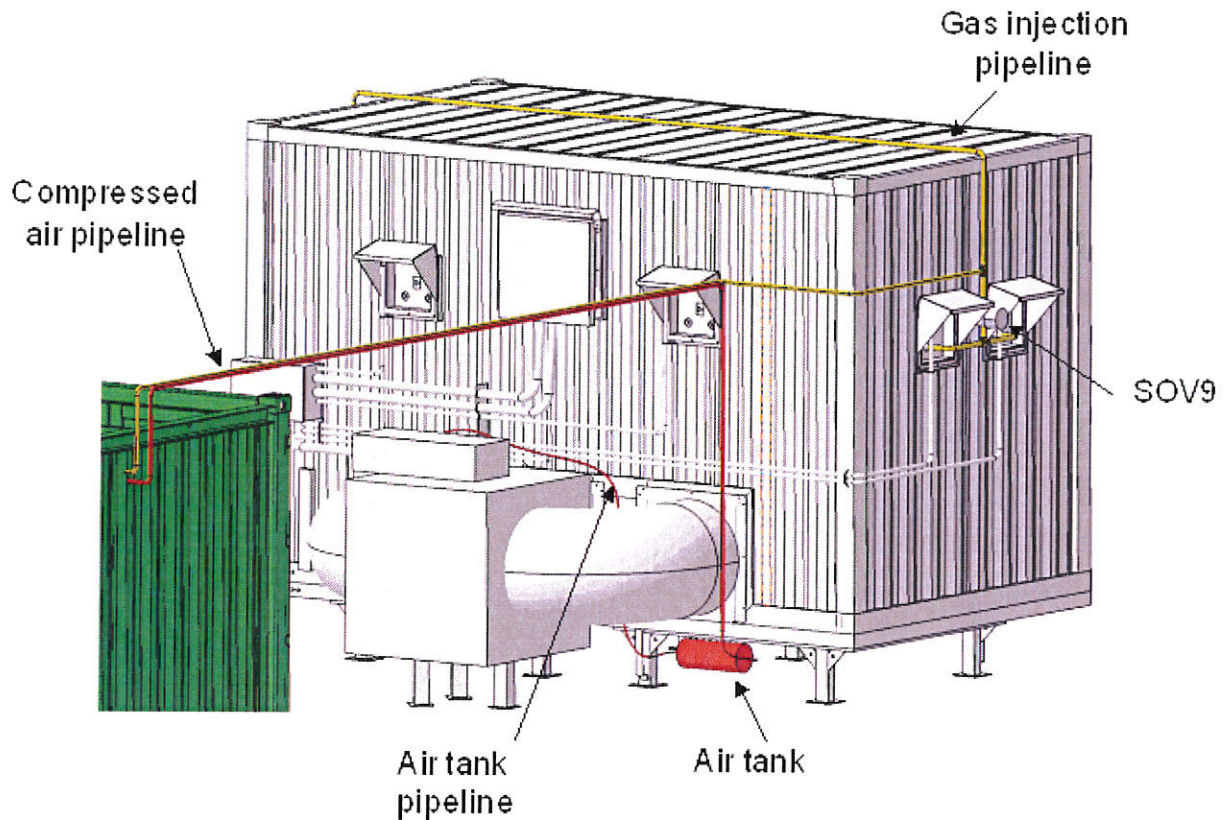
Typical assembly of compressed air pipeline with air tank
